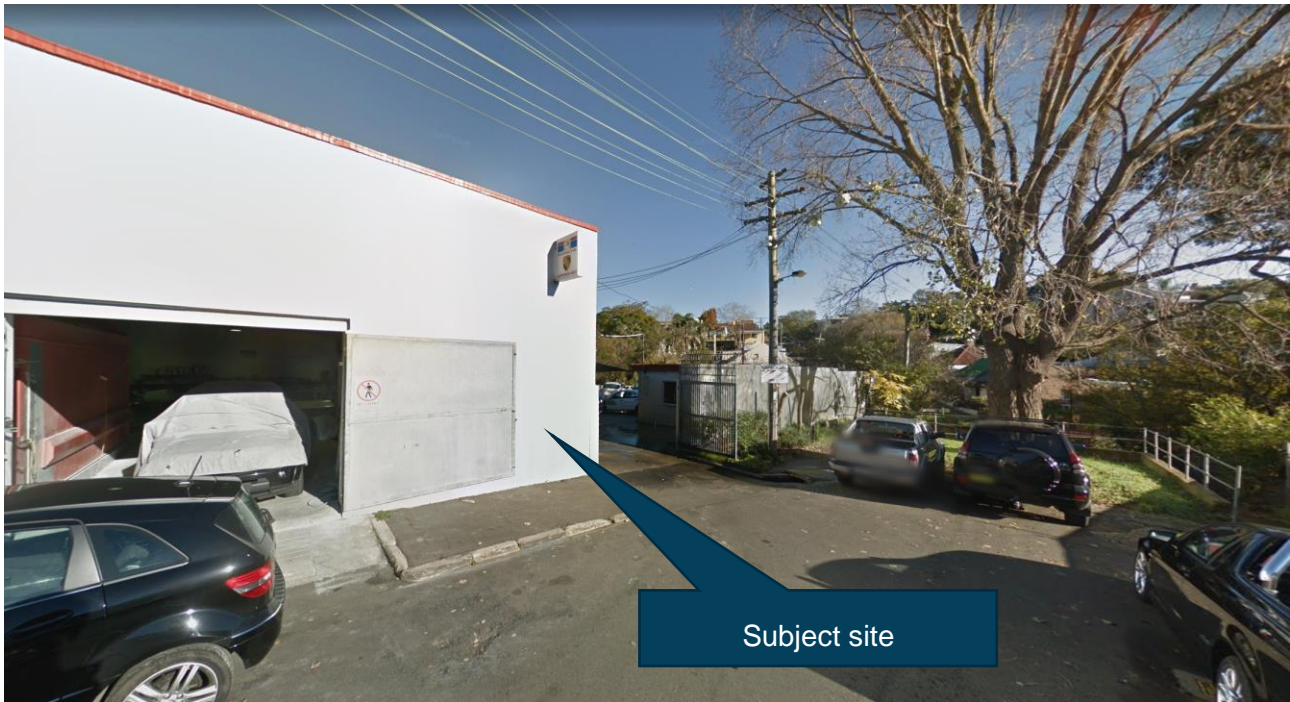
Site frontage to Chester Street, looking west (source: Google)
